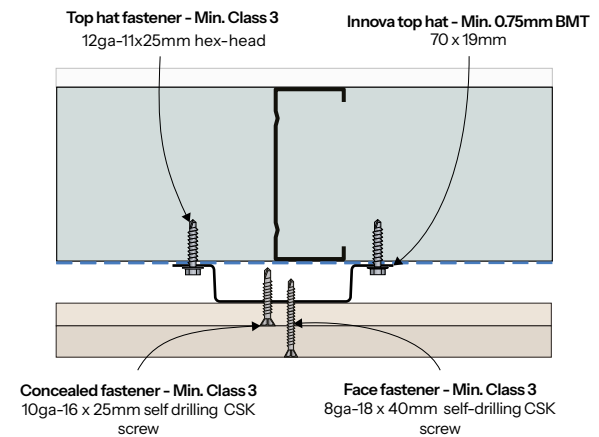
Steel frame - cavity fix (19mm) fastener detail Plan
